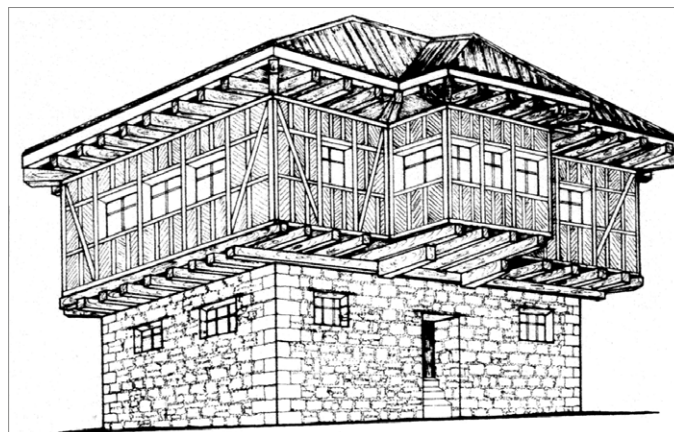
Wooden frame uilging system of traditional ooden frame system on the upper floor is Adapazari, Turkey (drawing: M. Ciampa).
